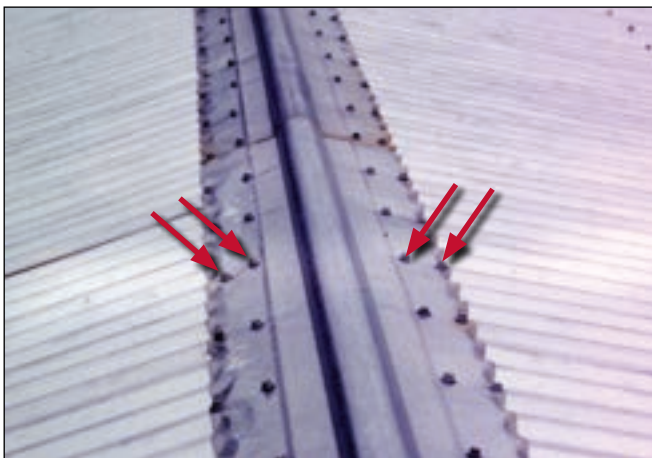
The ridge flashing on these corrugated metal panels had two rows of fasteners on each side of the ridge line.
